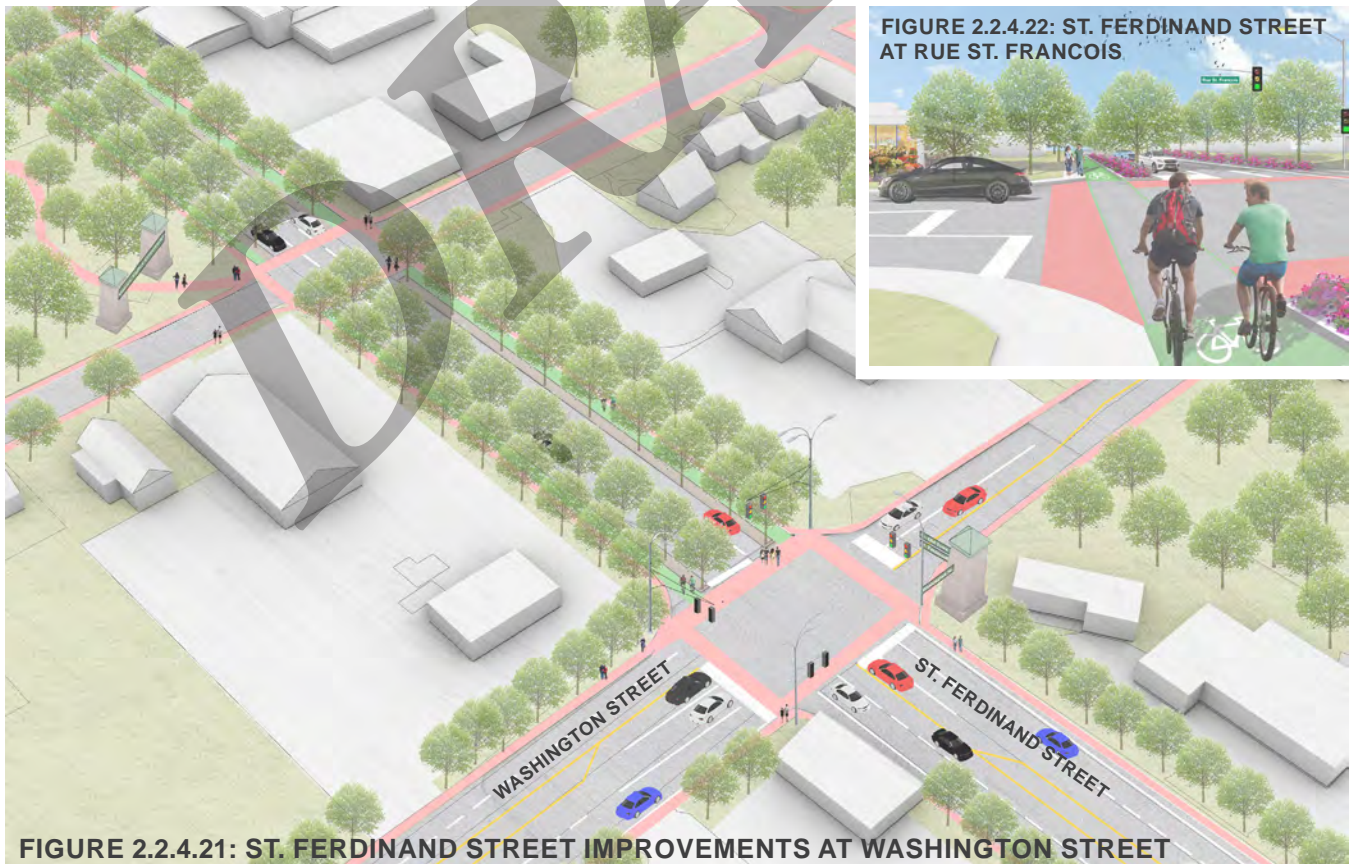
ST. FERDINAND STREET IMPROVEMENTS AT WASHINGTON STREET
